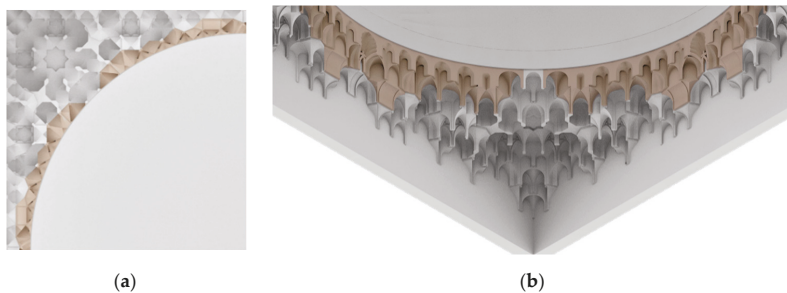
Deformed muqarnas in western Pavilion pendentive [own drawing]: (a) Plan; (b) axonometry.
